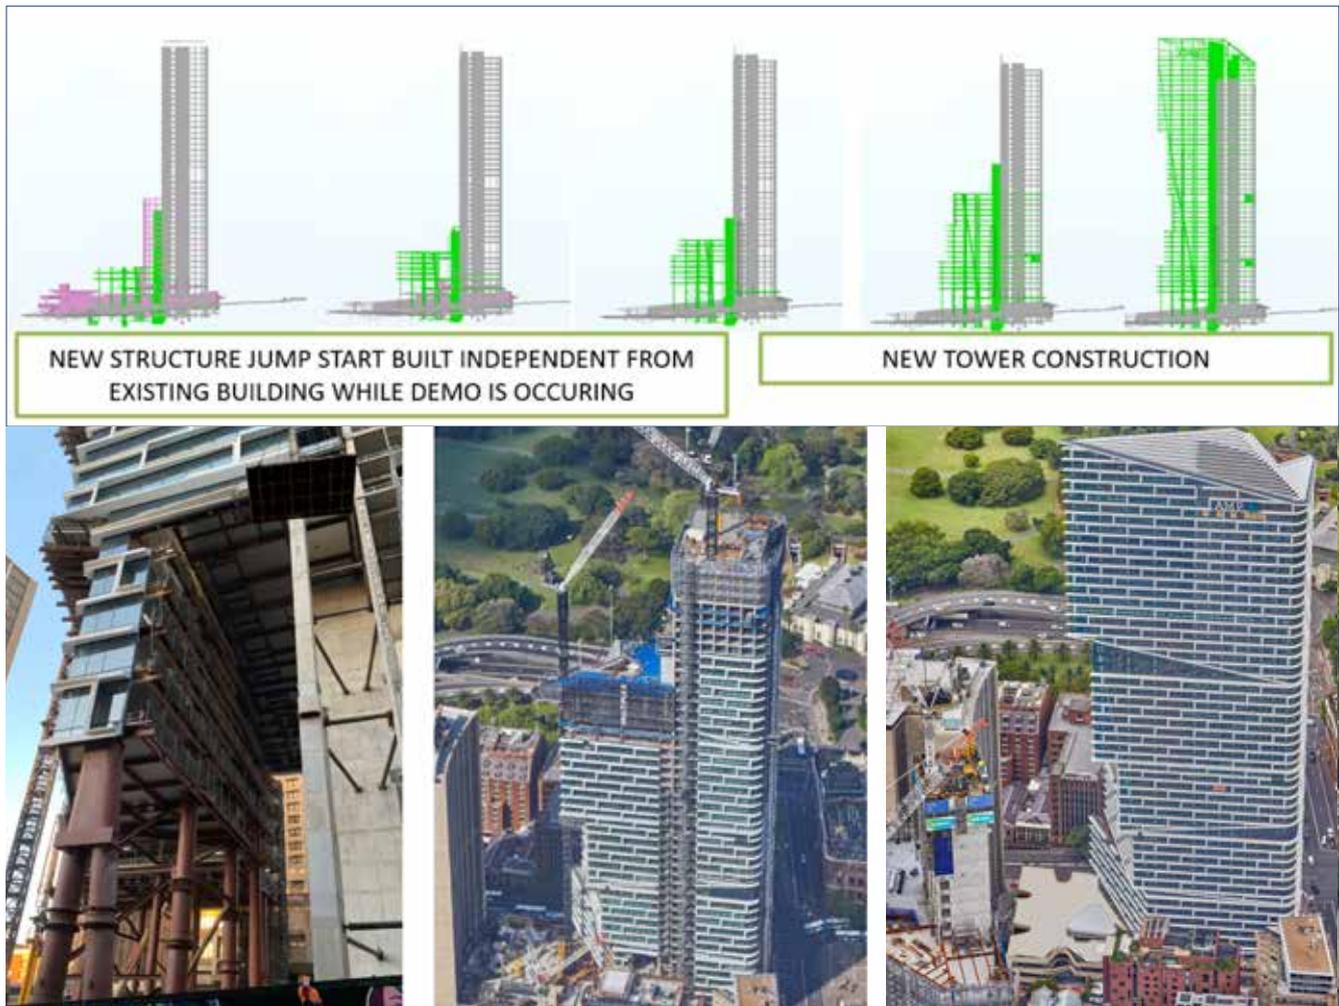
North Jumpstart structure bridged across to existing building and demolition complete (left), New tower construction underway (centre), completed building (right)."
